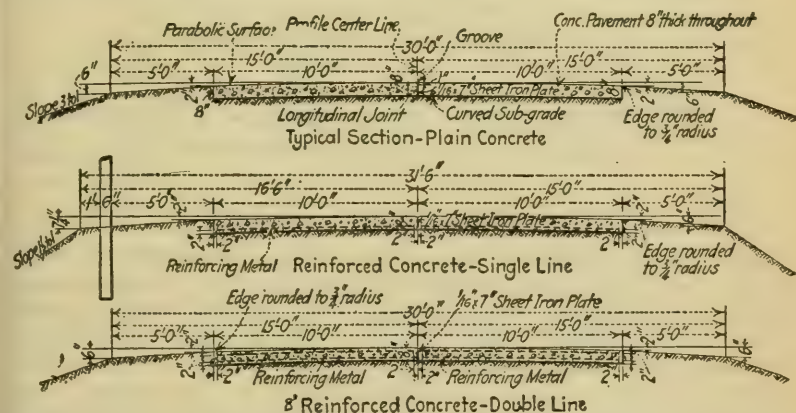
State of New Jersey (1922) Standard plain and reinforced concrete pavements.
